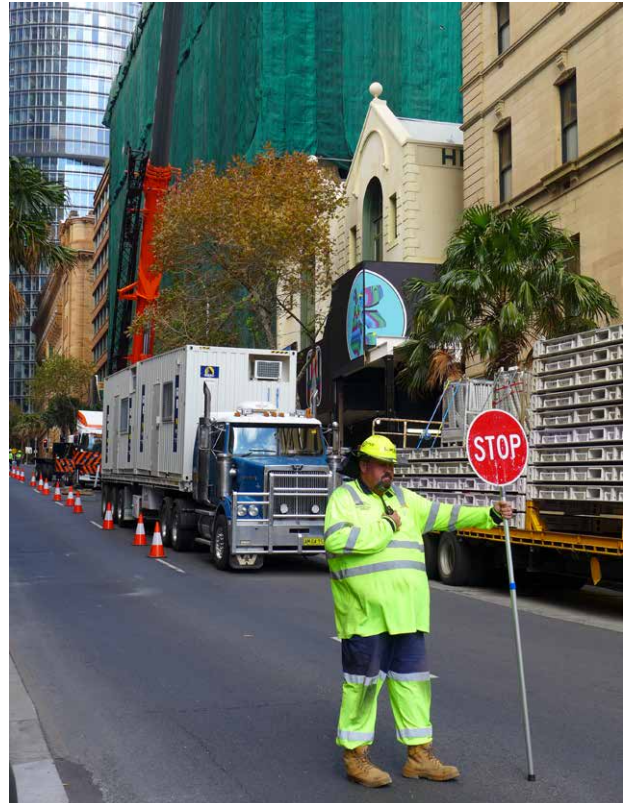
Only authorised accredited traffic controllers must be used in cases where traffic / pedestrian control is required or necessary.
